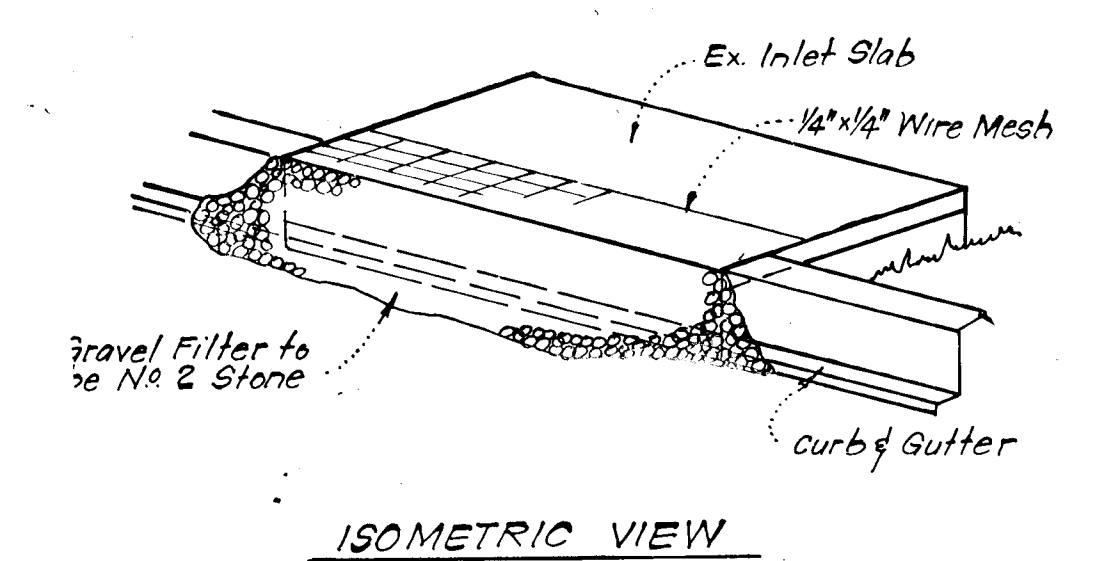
DETAILS OF STONE FILTER OUTLET (S.F.O.)
